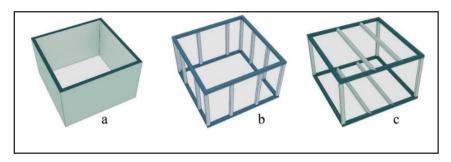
Permanent elements: a) walls, b) columns, c) beams
